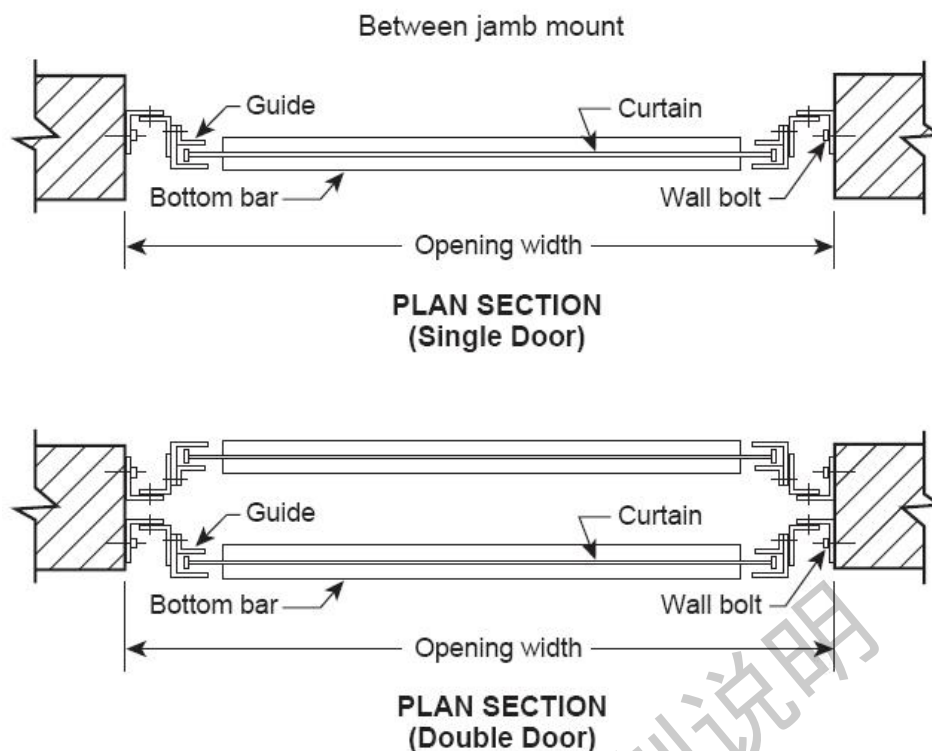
(1) Rolling Steel Doors — Mounted Between Jambs.
